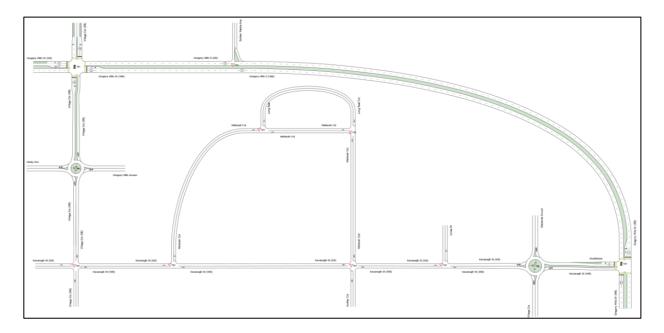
Existing intersection layout as modelled in SIDRA Intersection 9
